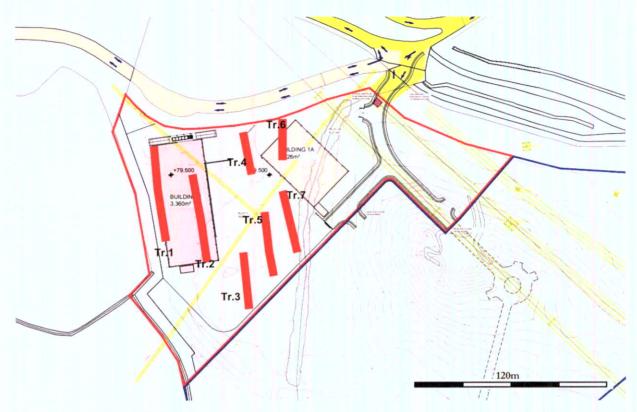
Location of 20E0601 archaeological test trenches overlain on proposed development layout plan.
